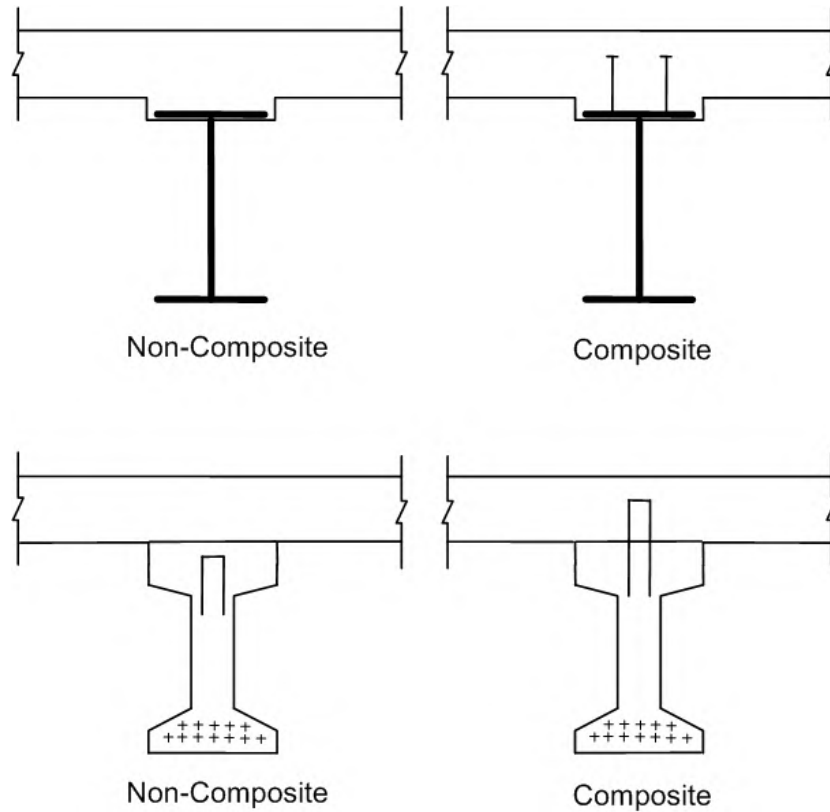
Non-Composite or Composite Concrete Deck on Steel Beams and Pretressed Concrete Beams
